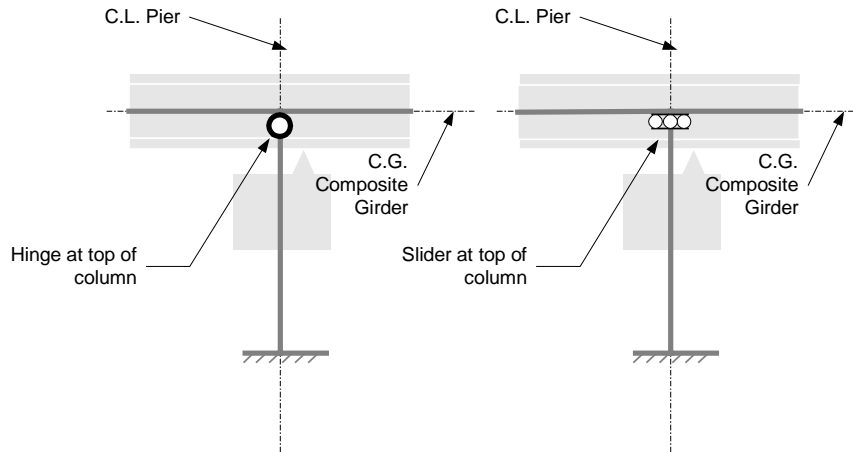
Continuous Pier Connection on a Fixed Height Idealized Pier
